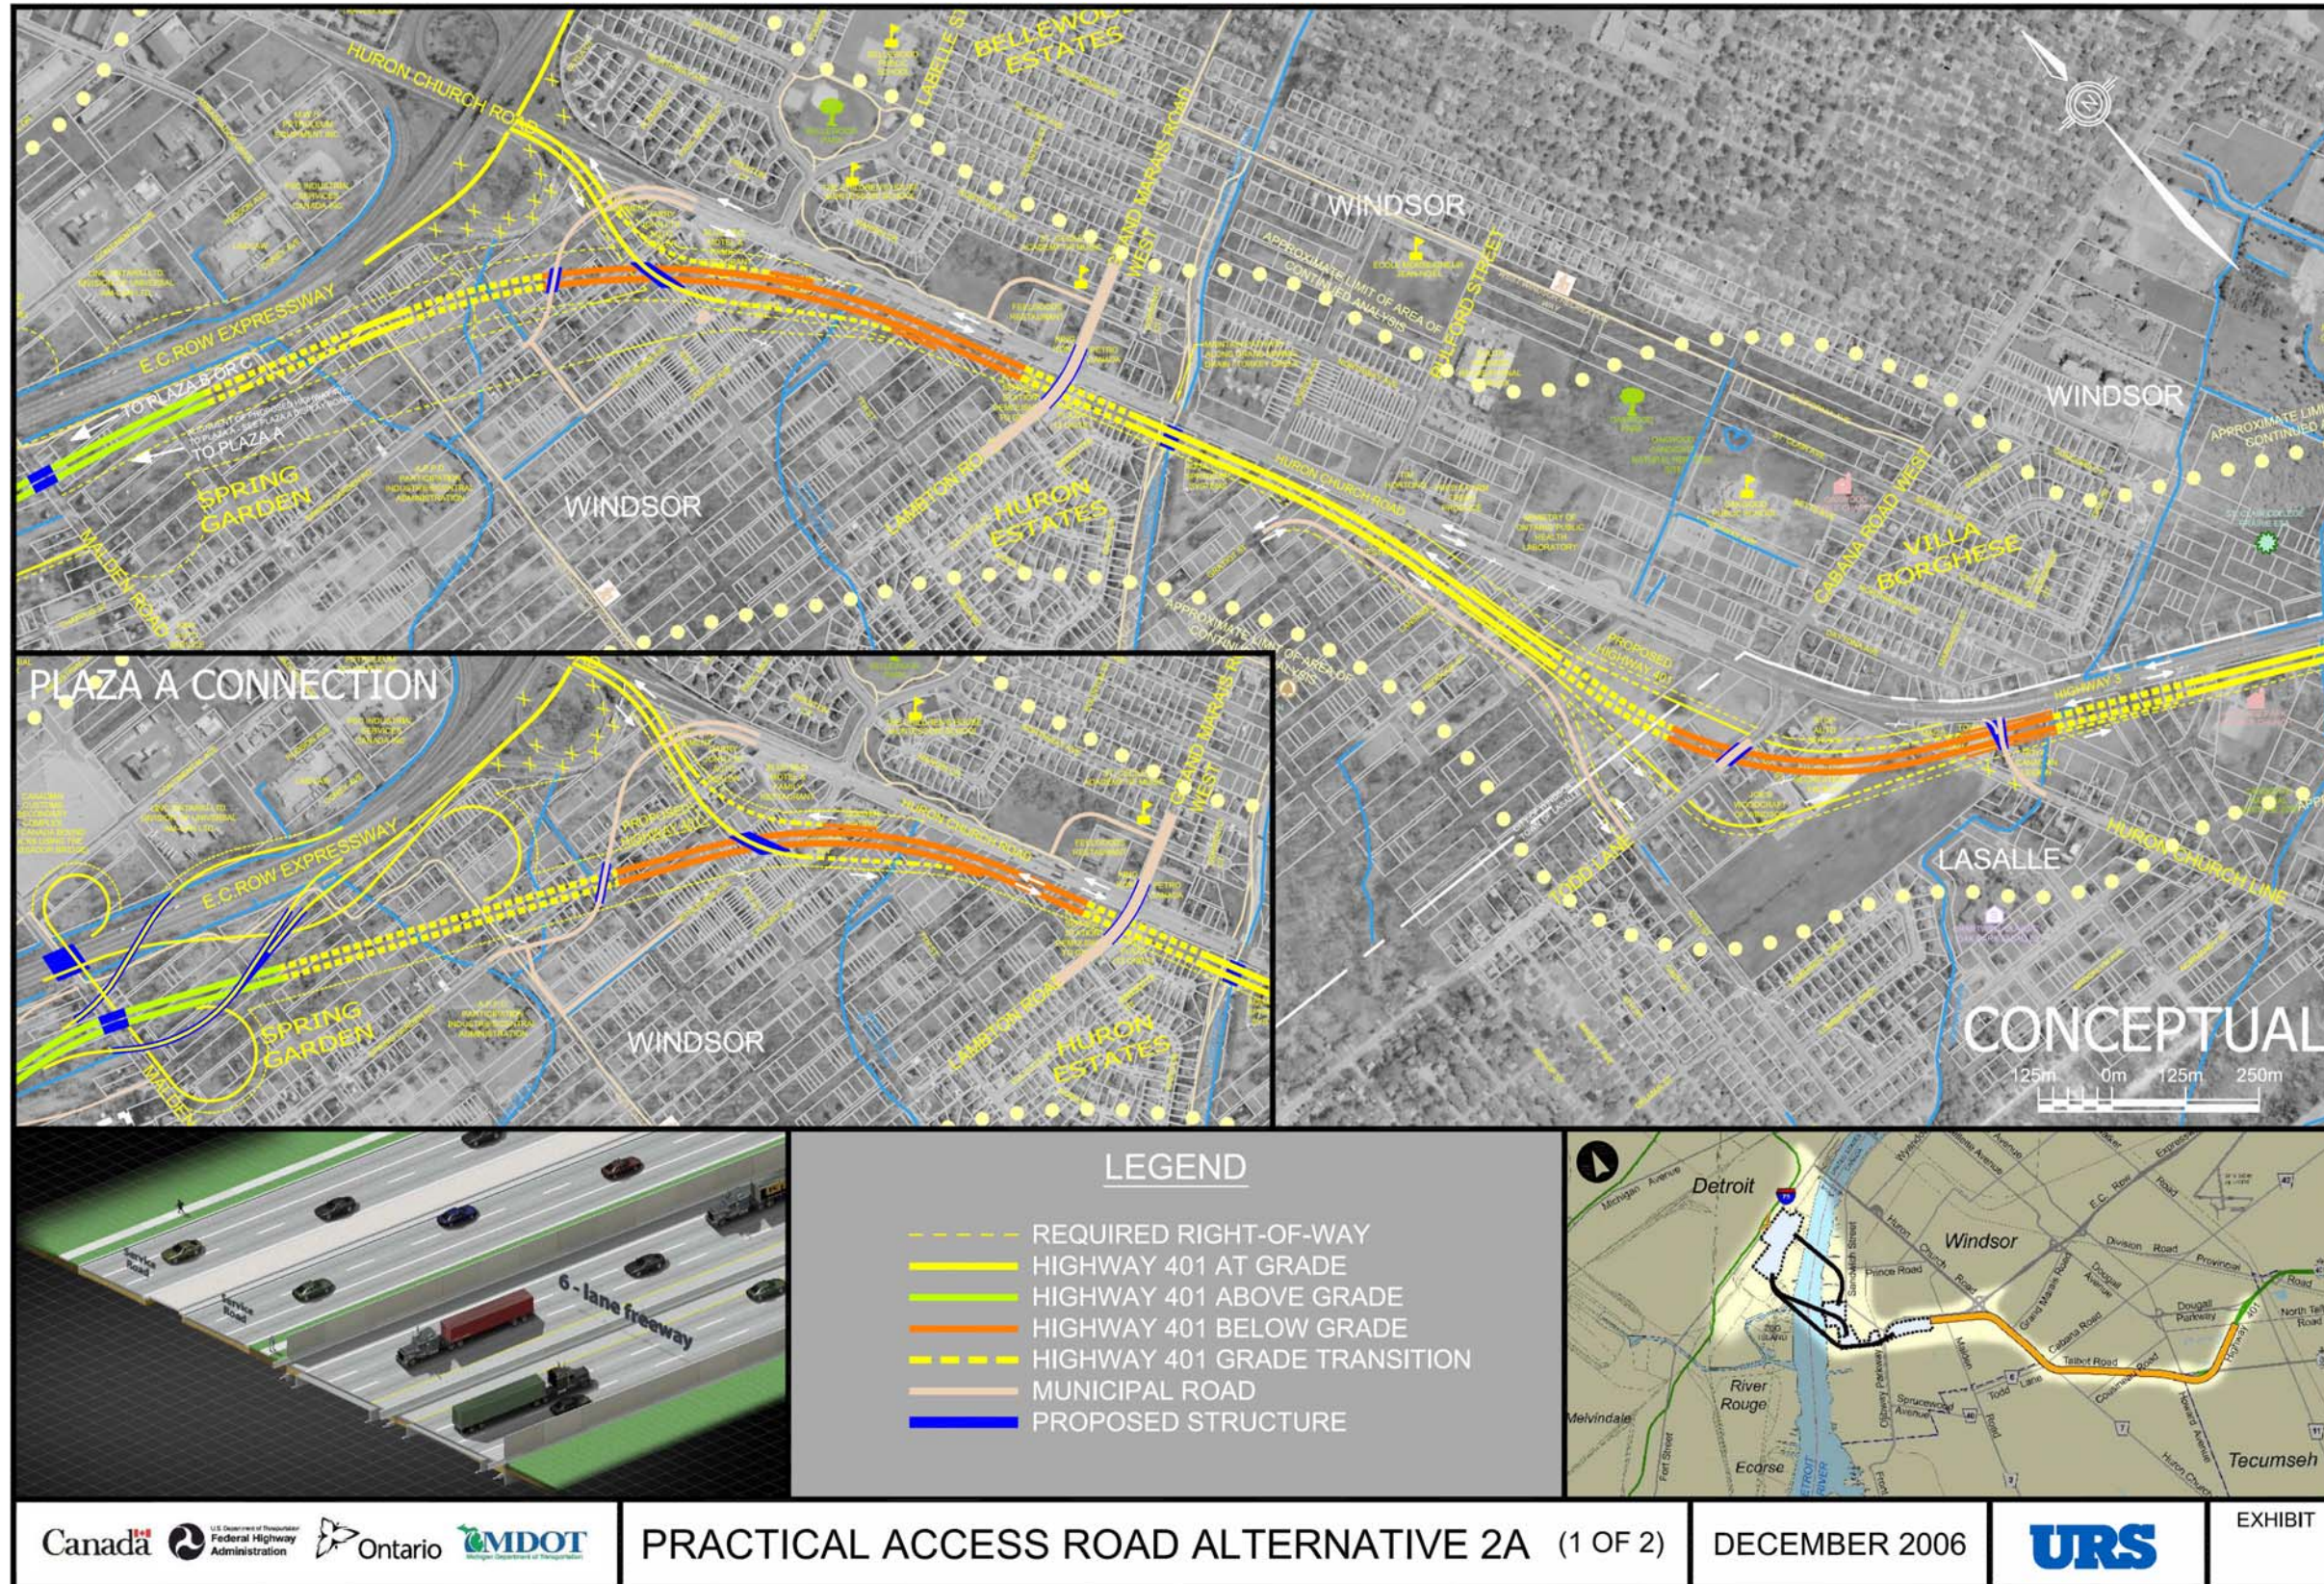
B – PRACTICAL ACCESS ROAD ALTERNATIVE 2A
